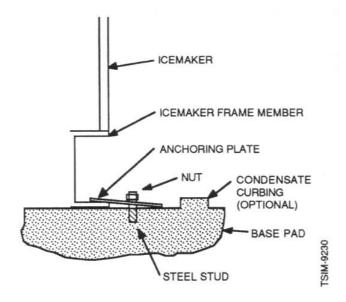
Icemaker To Concrete Pad (Steel Plate)
